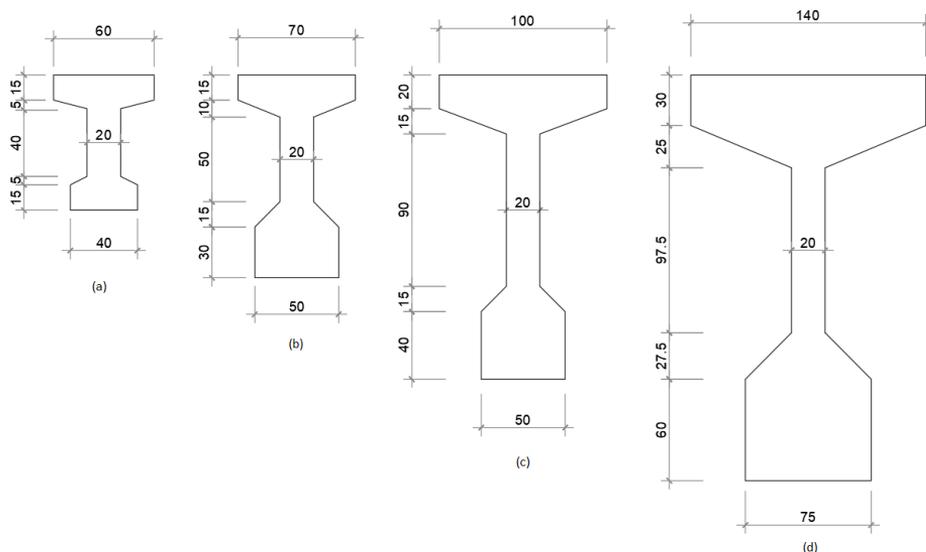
Cross section of bridge girder beams. Dimensions in cm.
